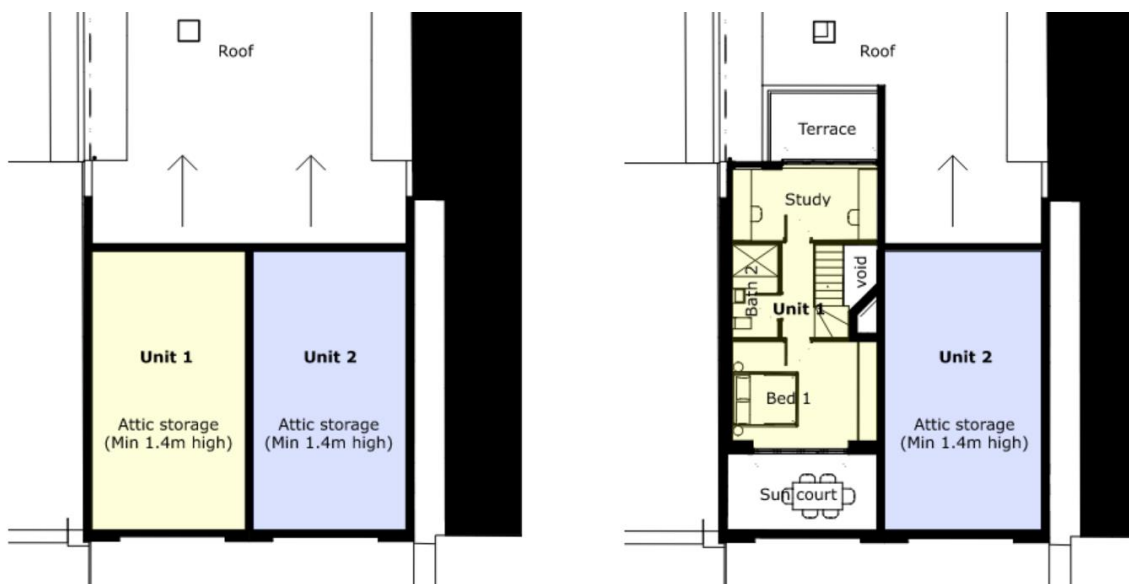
Existing (left) and proposed (right) GFA plans – Level 3 (Source: Saltbush)
